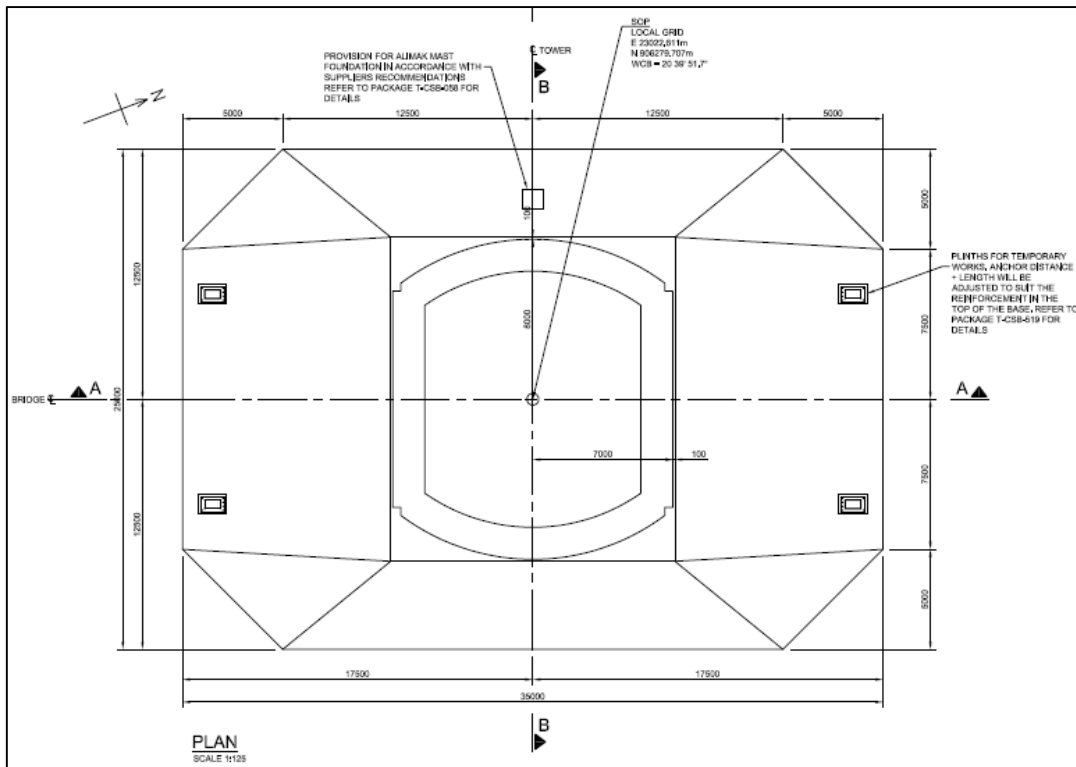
Central Tower foundation, Plan (Ramboll i, 2015)
